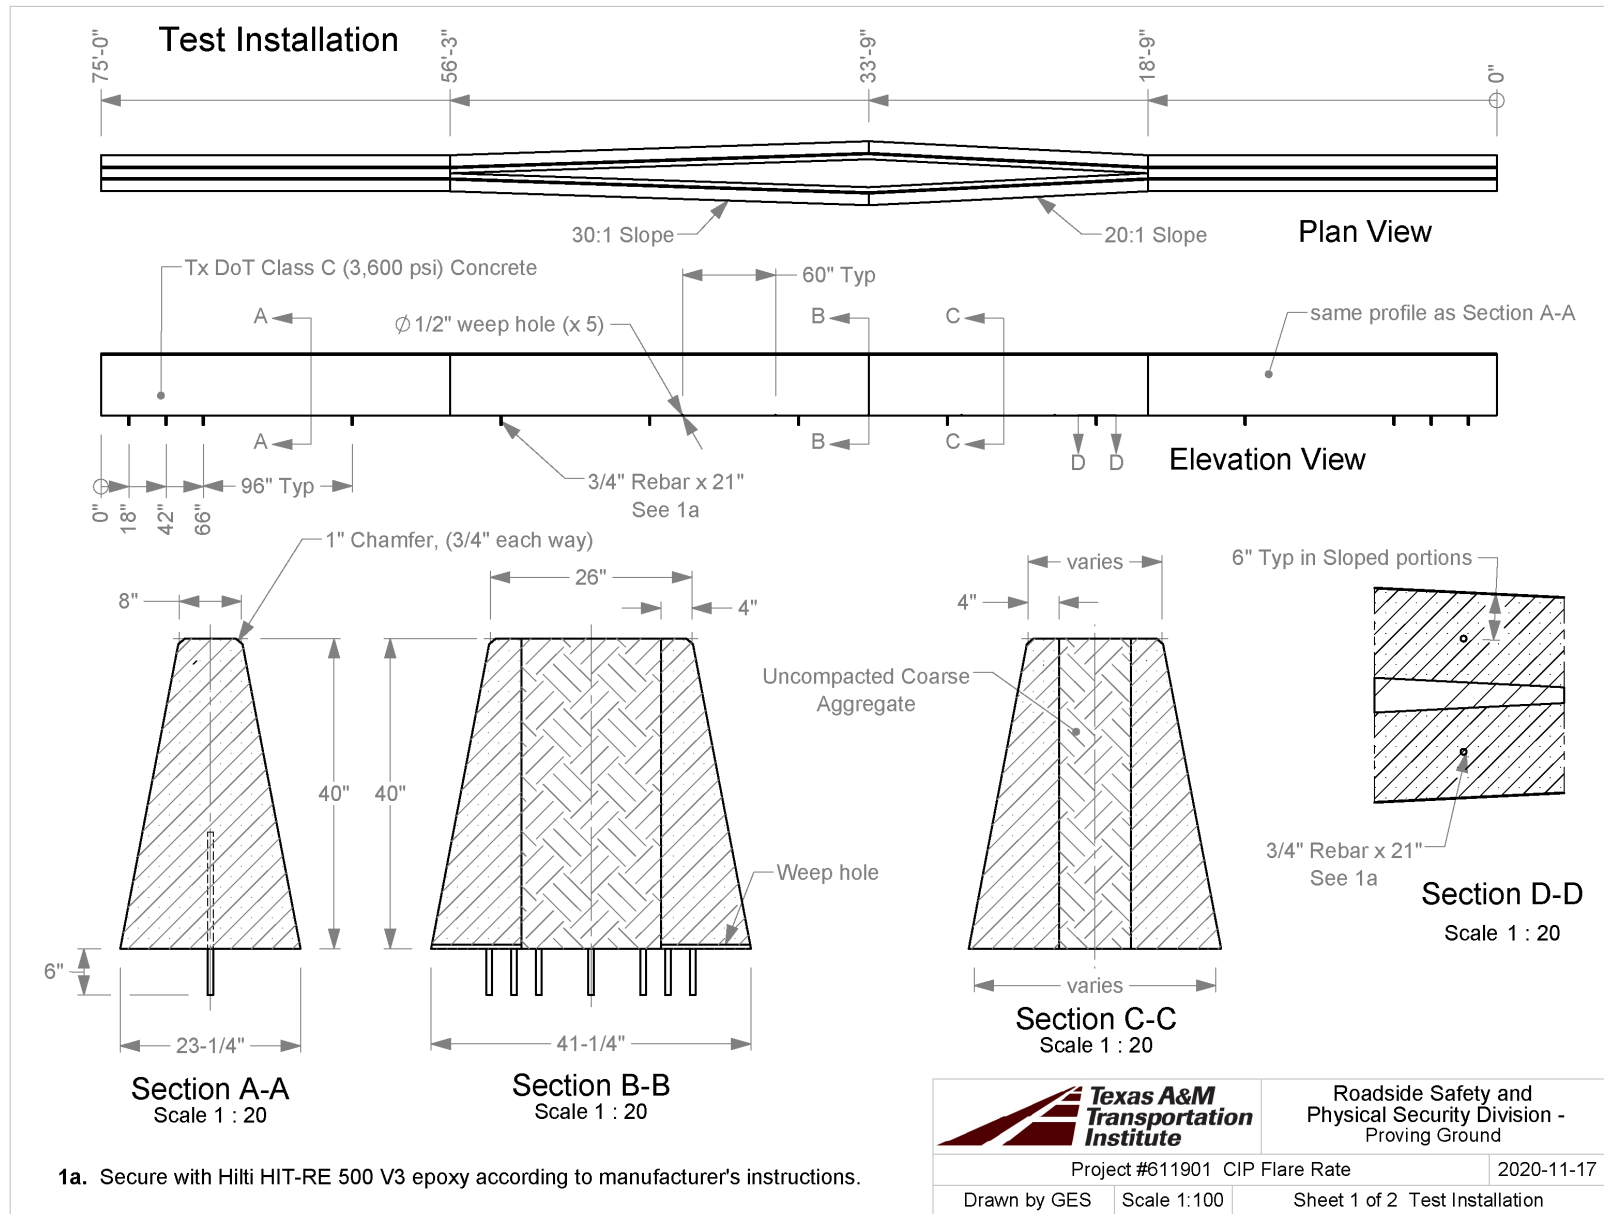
Details of Critical Flare Concrete Barrier System.
